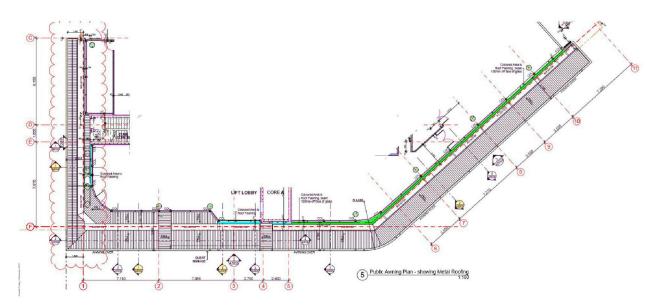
North Elevation showing the location of the proposed extension to the awning (see red bubble).
